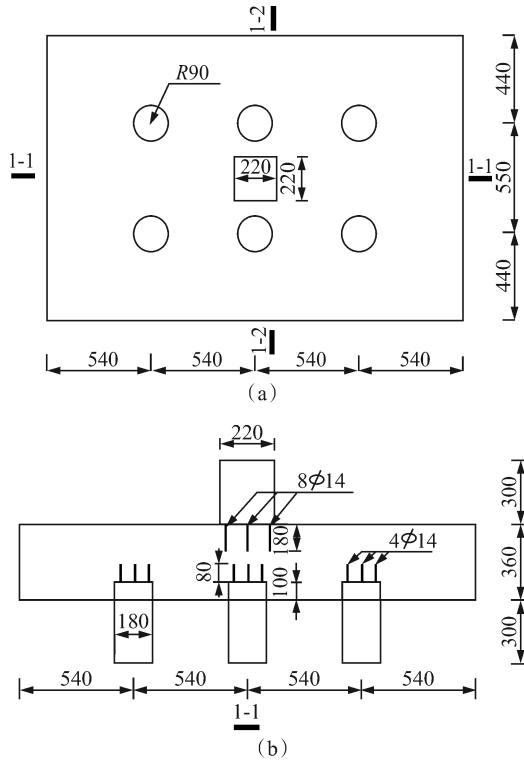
Specimen dimensions (unit: mm). (a) Plan view; (b) Section 1-1
